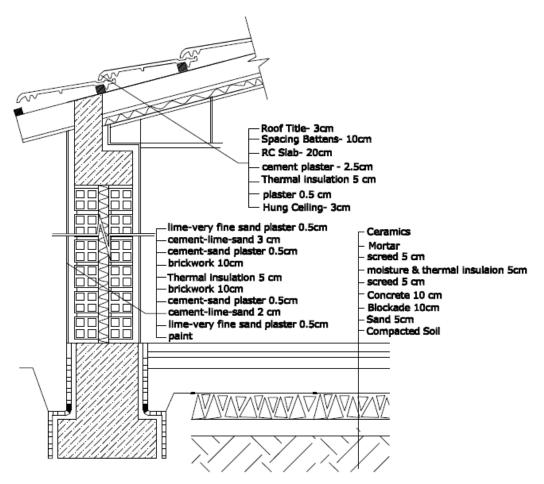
Construction Technique in Contemporary period- Brick wall - C_8
